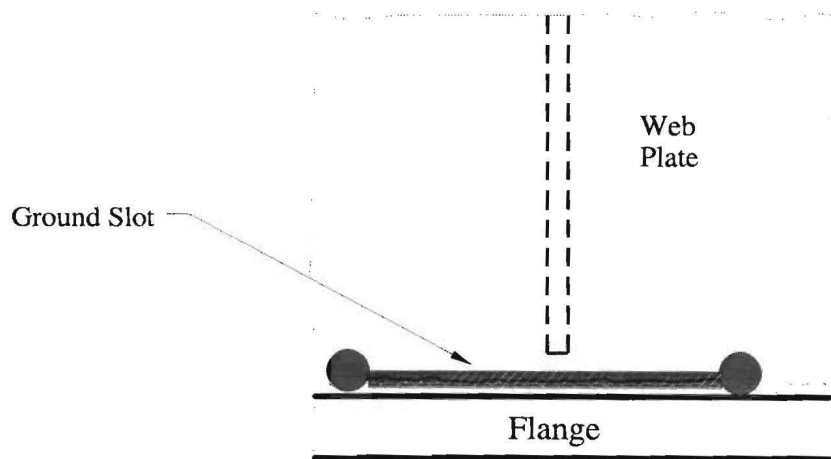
Removal of web-to-flange fillet weld crack.
